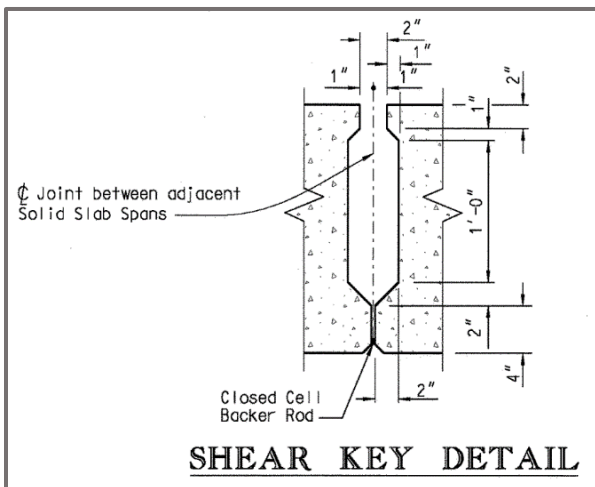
Solid-slab beam shear key detail with minimum 2-inch joint opening © 2018 SCDOT
